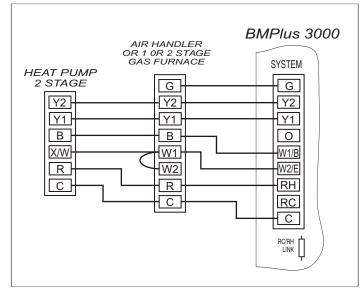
3 Heat / 2 Cool Heat Pump with B (Heat) Type Reversing Valve
